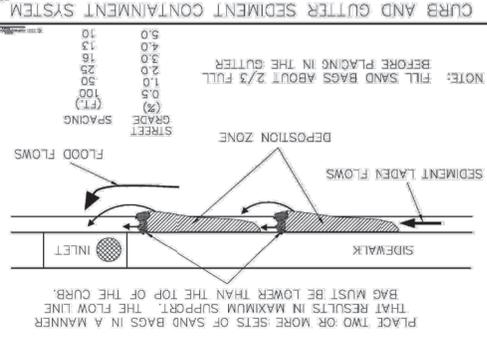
Illustration of a Curb and Gutter Sediment Containment System
